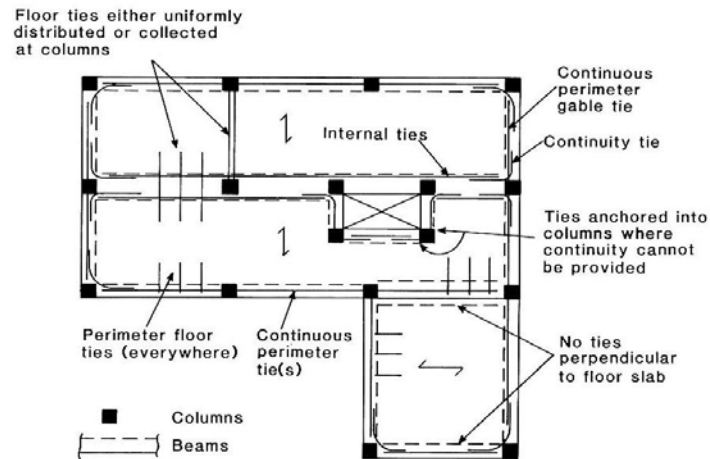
Details and locations of horizontal floor ties in a precast floor, after [14]
